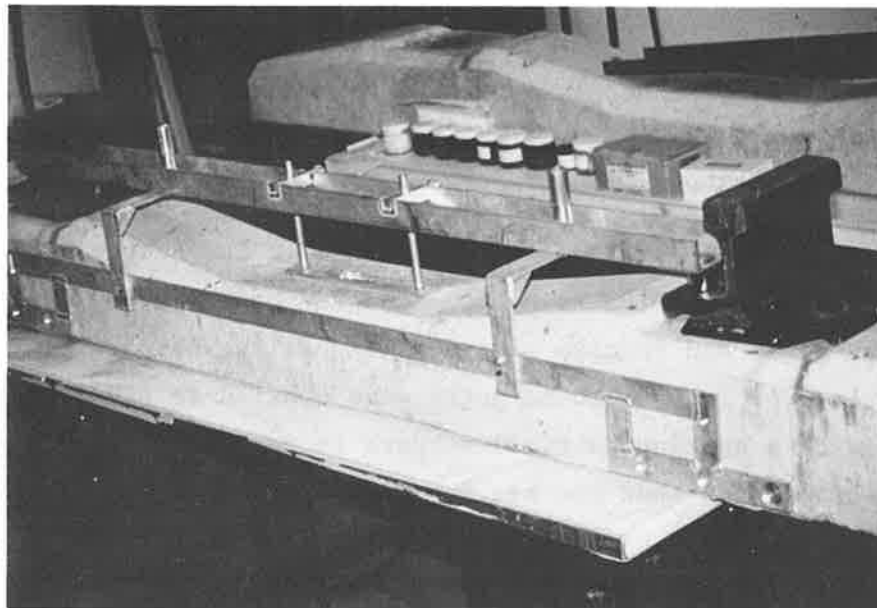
STRAIN GAGE LOCATING FIXTURE POSITIONED ON CONCRETE CROSSTIE
